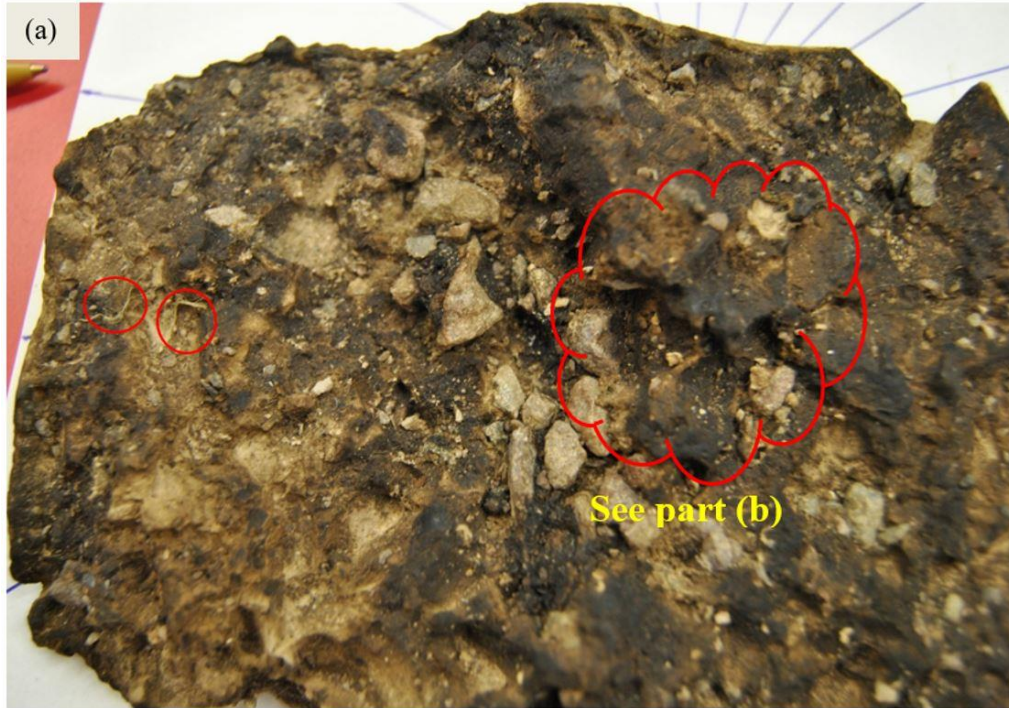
Photos Taken from the Aramid Fibers Distributed on the Surface Fracture of Each FB Mix; (a) Overall View of Casting Surface and (b) Enlarged Photo of Central Section.
